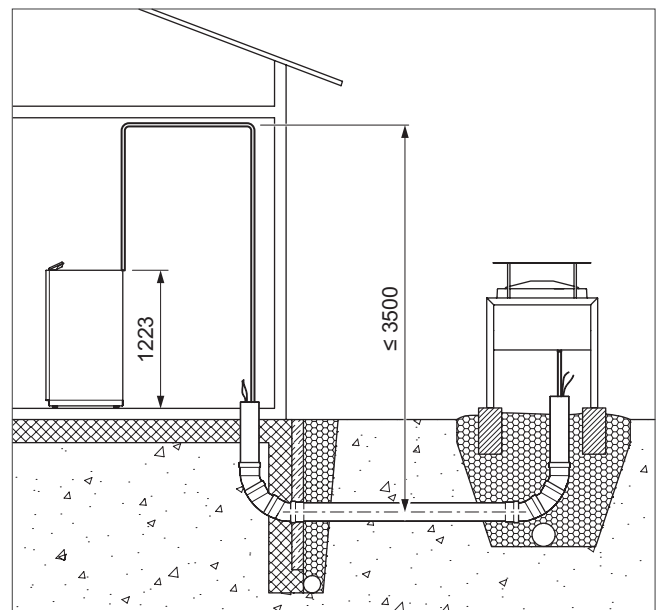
Refrigerant pipes on the ceiling, connected by a sensor pocket that is laid in the ground
